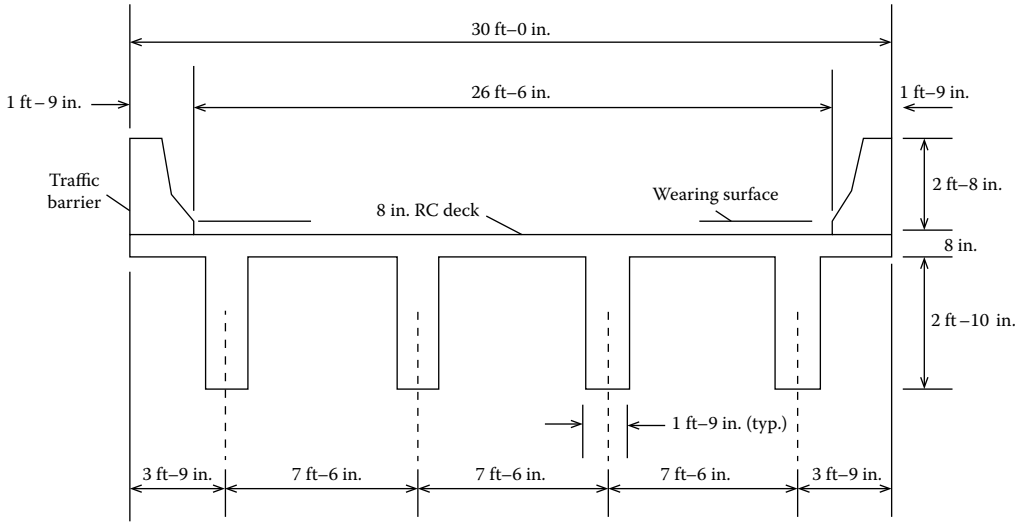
Cross section of T-beam bridge of Example 5.2.
